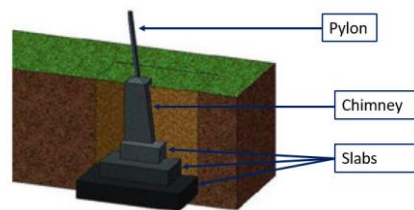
Typical concrete foundations of high-voltage electricity pylons.
